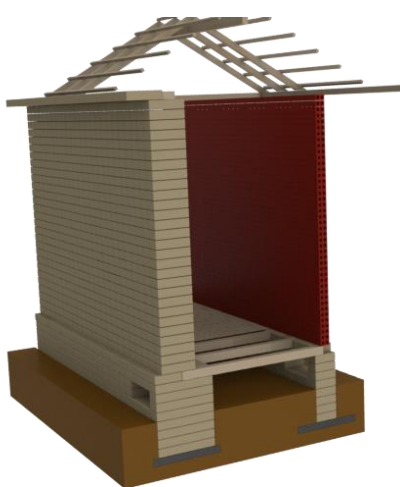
Traditional adobe system construction (Solution T) [credits Alice Tavares]
